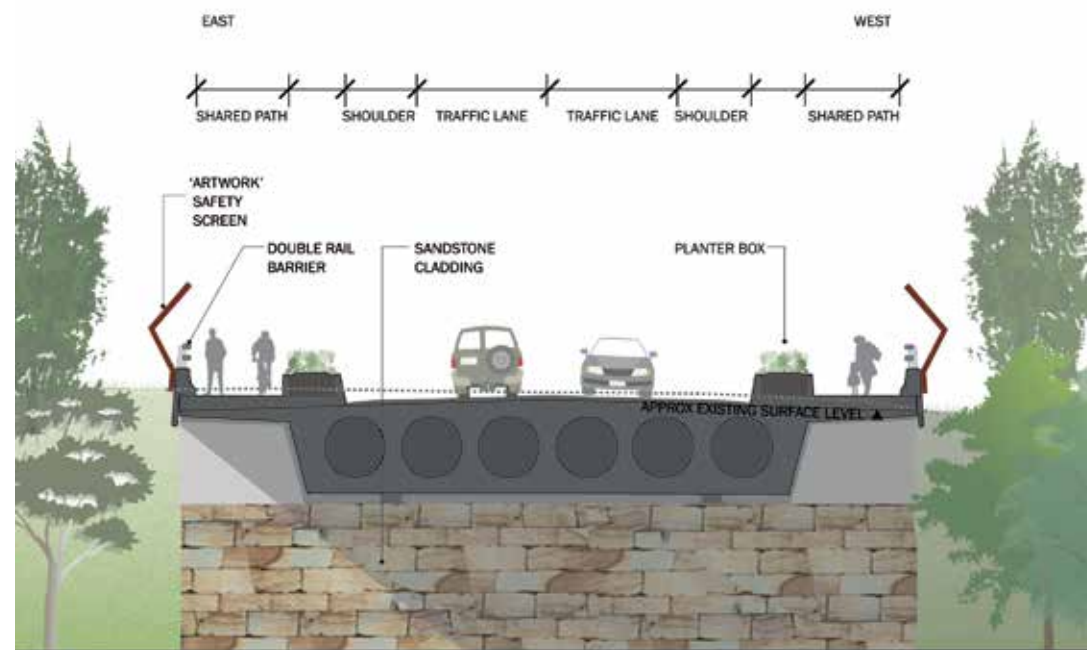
Section – Bridge SB08: Kangaroo Valley Road Overbridge (Scale: 1:200@A3)
